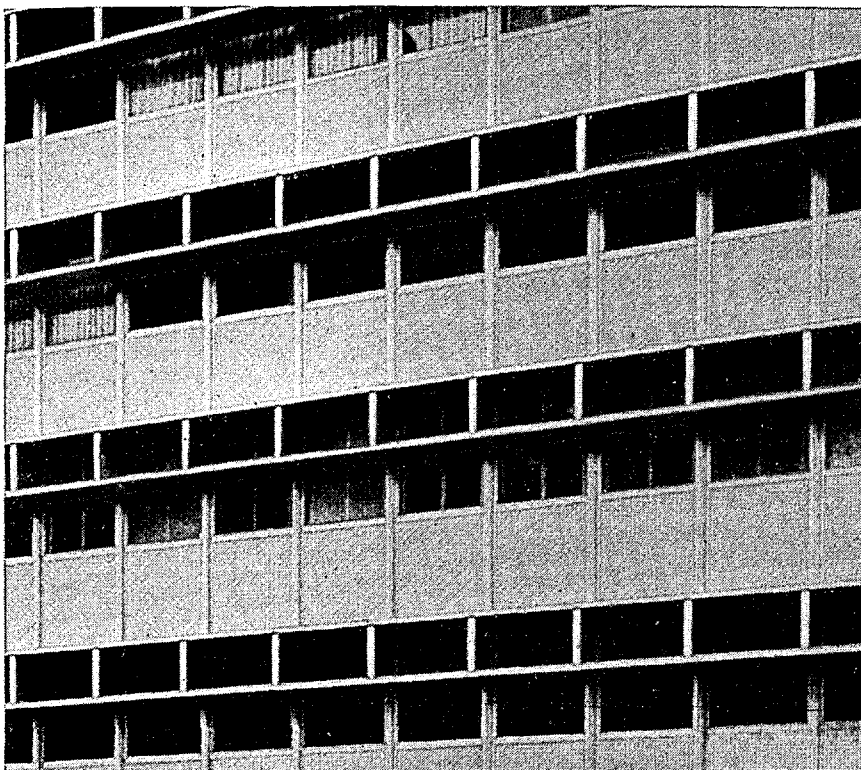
Addition to First National Bank Building, Oklahoma City (elevation and detail of wall, above). This 14-story panel curtain wall is secured to framing by very thin— $1\frac{1}{4}$ " x 4" x .180"—tubing.
